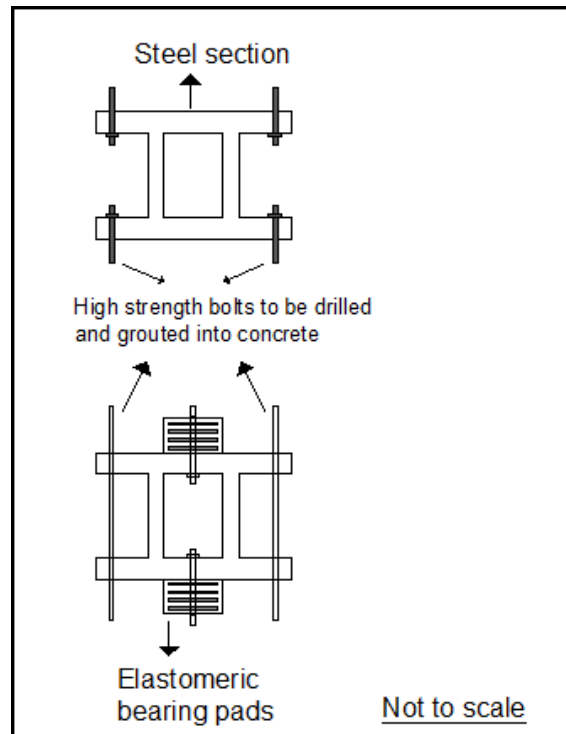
1 Proposed steel section for hinge connection retrofitting.
